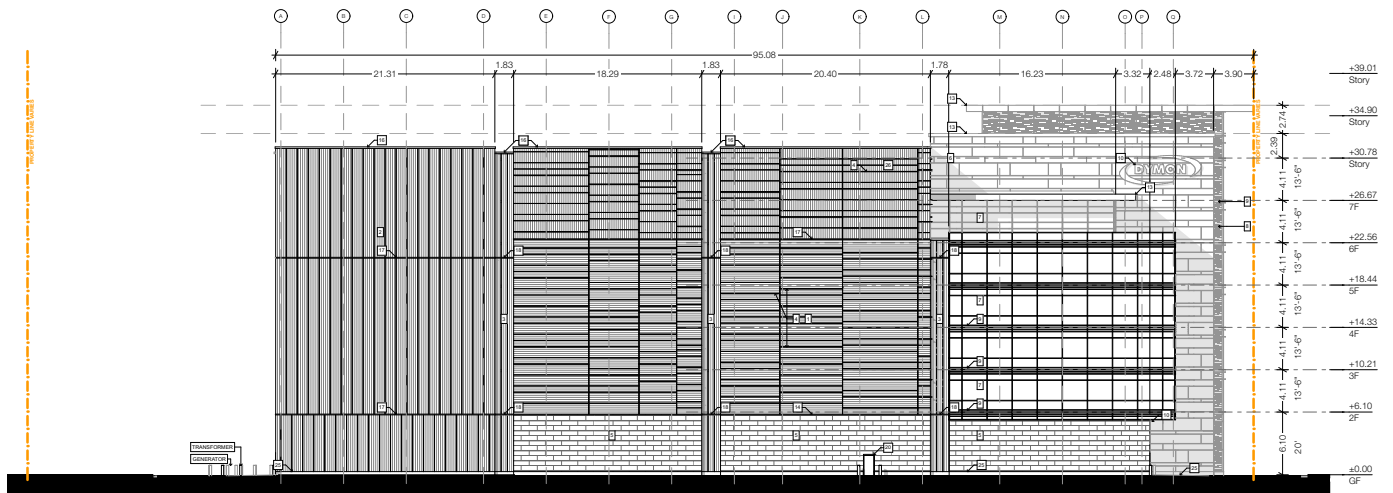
North Elevation of the proposed building by TACT Architecture Inc.
